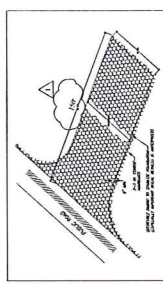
Plan view of construction entrance/exit pad.
